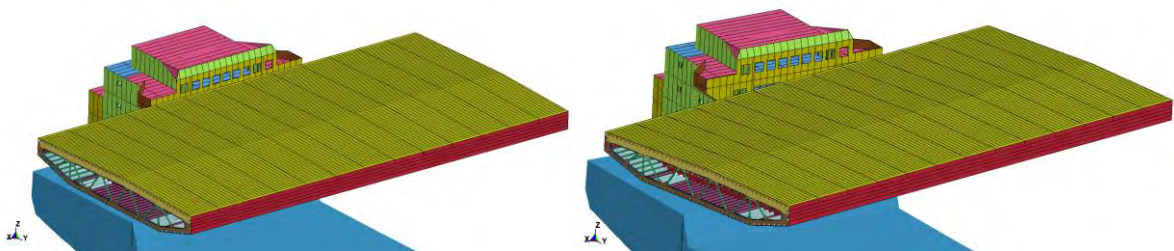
Deckhouse-bridge girder collisions with 0 degrees (left) and 10 degrees (right) relative angle between ship surge and bridge transversal directions.
